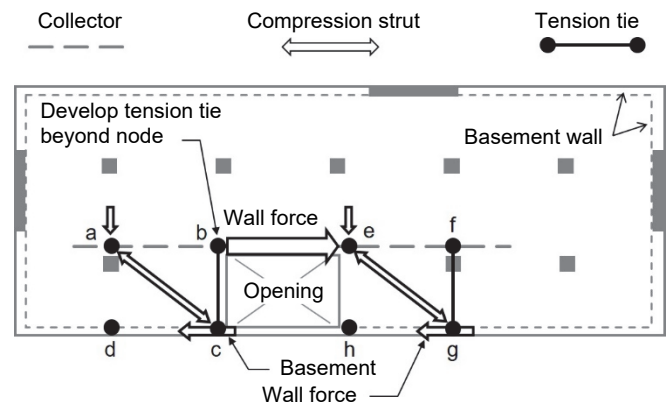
Strut-and-tie model at force transfer to basement wall.
